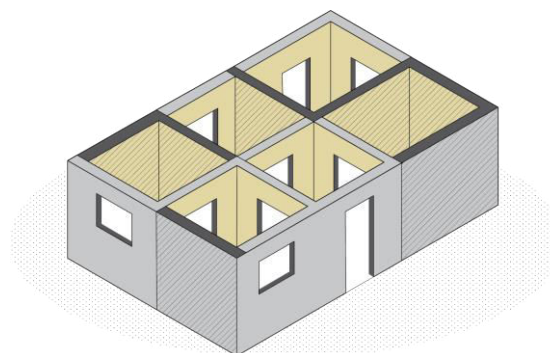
The walls sectioned in black are confined-masonry walls used in non-engineered houses as effective bracing walls due to their lack of penetrations.
